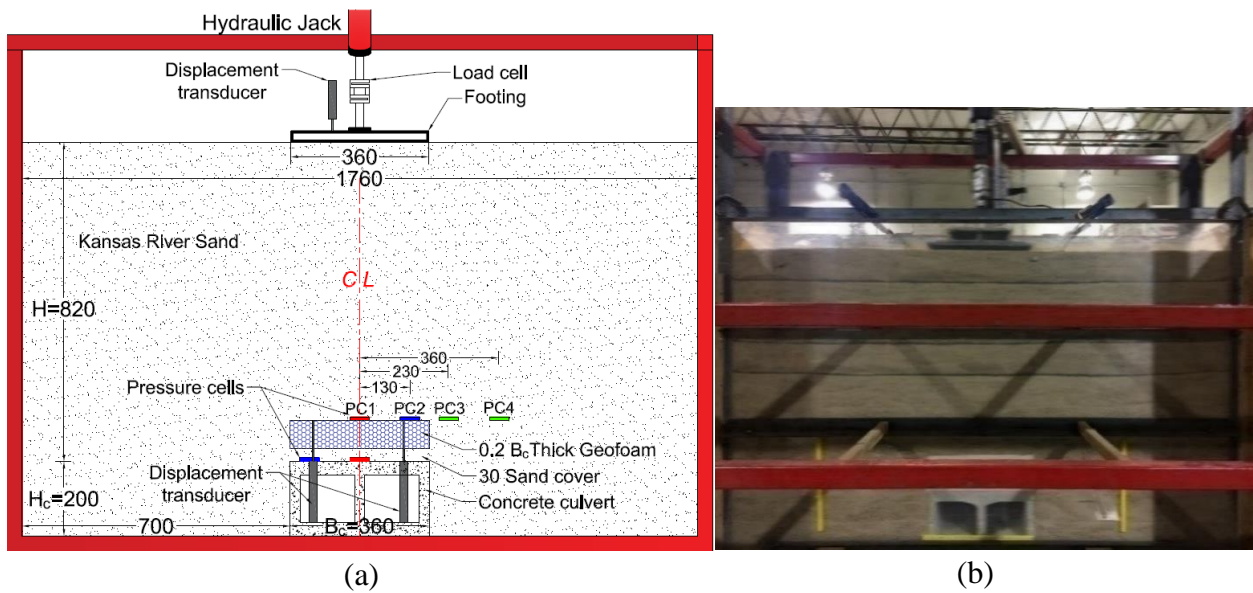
Test box: (a) cross section showing locations and dimensions of the concrete culvert, EPS geofoam, footing, and instrumentation (units: millimeters) and (b) photo.
